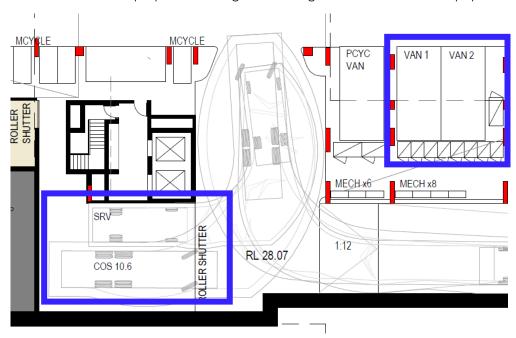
Excerpt of Basement Layout – Indicating Loading Dock Arrangement (outlined in blue)
